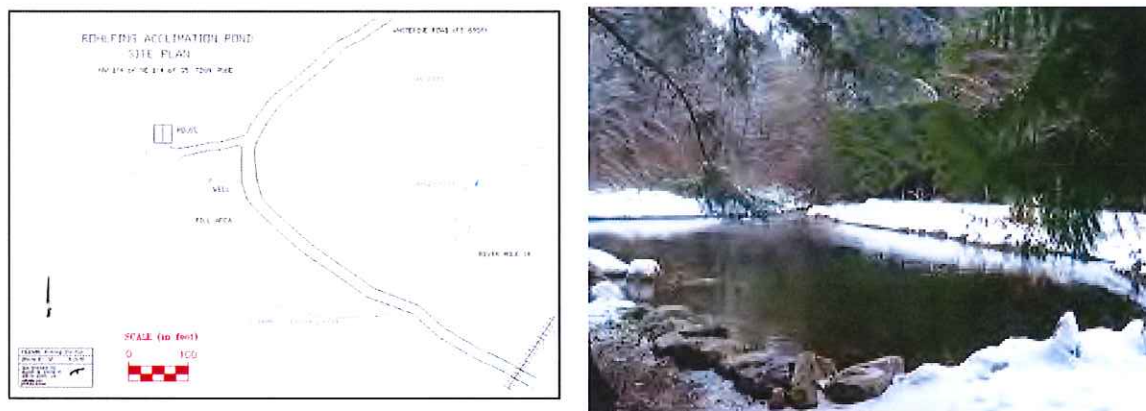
Rohlfing Acclimation Pond Plan and Photograph
